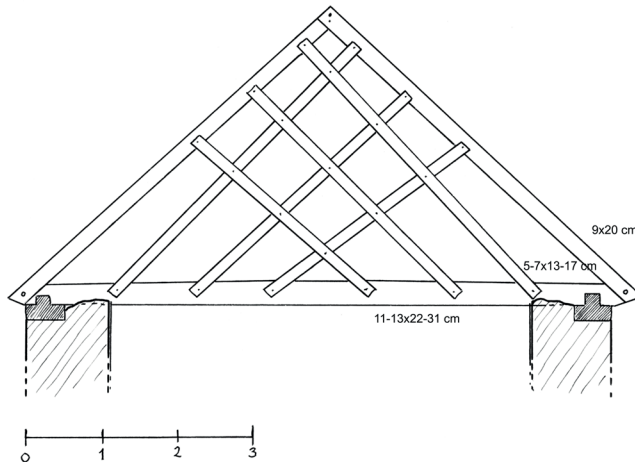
Jäla, nave (1124–1142 d). Reconstruction of the lattice trusses. The timbers are of remarkable thin dimensions and the spacing tight with a cc of 0,4 m. The struts were all nailed. Drawing by the author.
